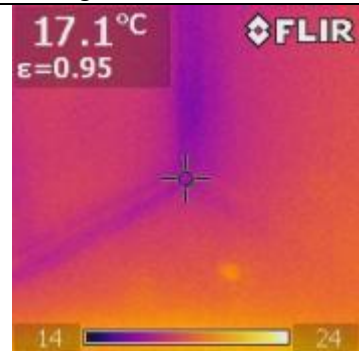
Bed room, leak in corner between skirting-board and floor.
